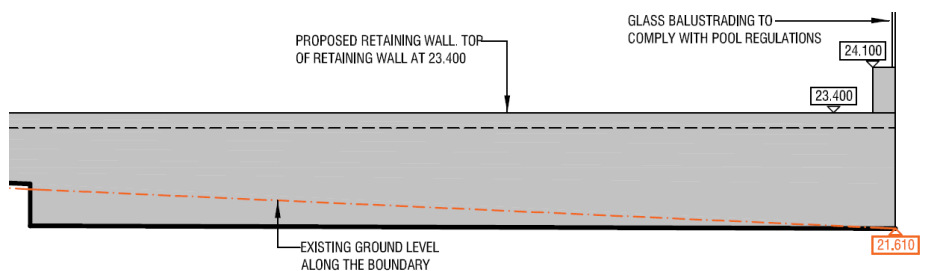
Elevation drawing of the amended plans, on the north-western elevation.
